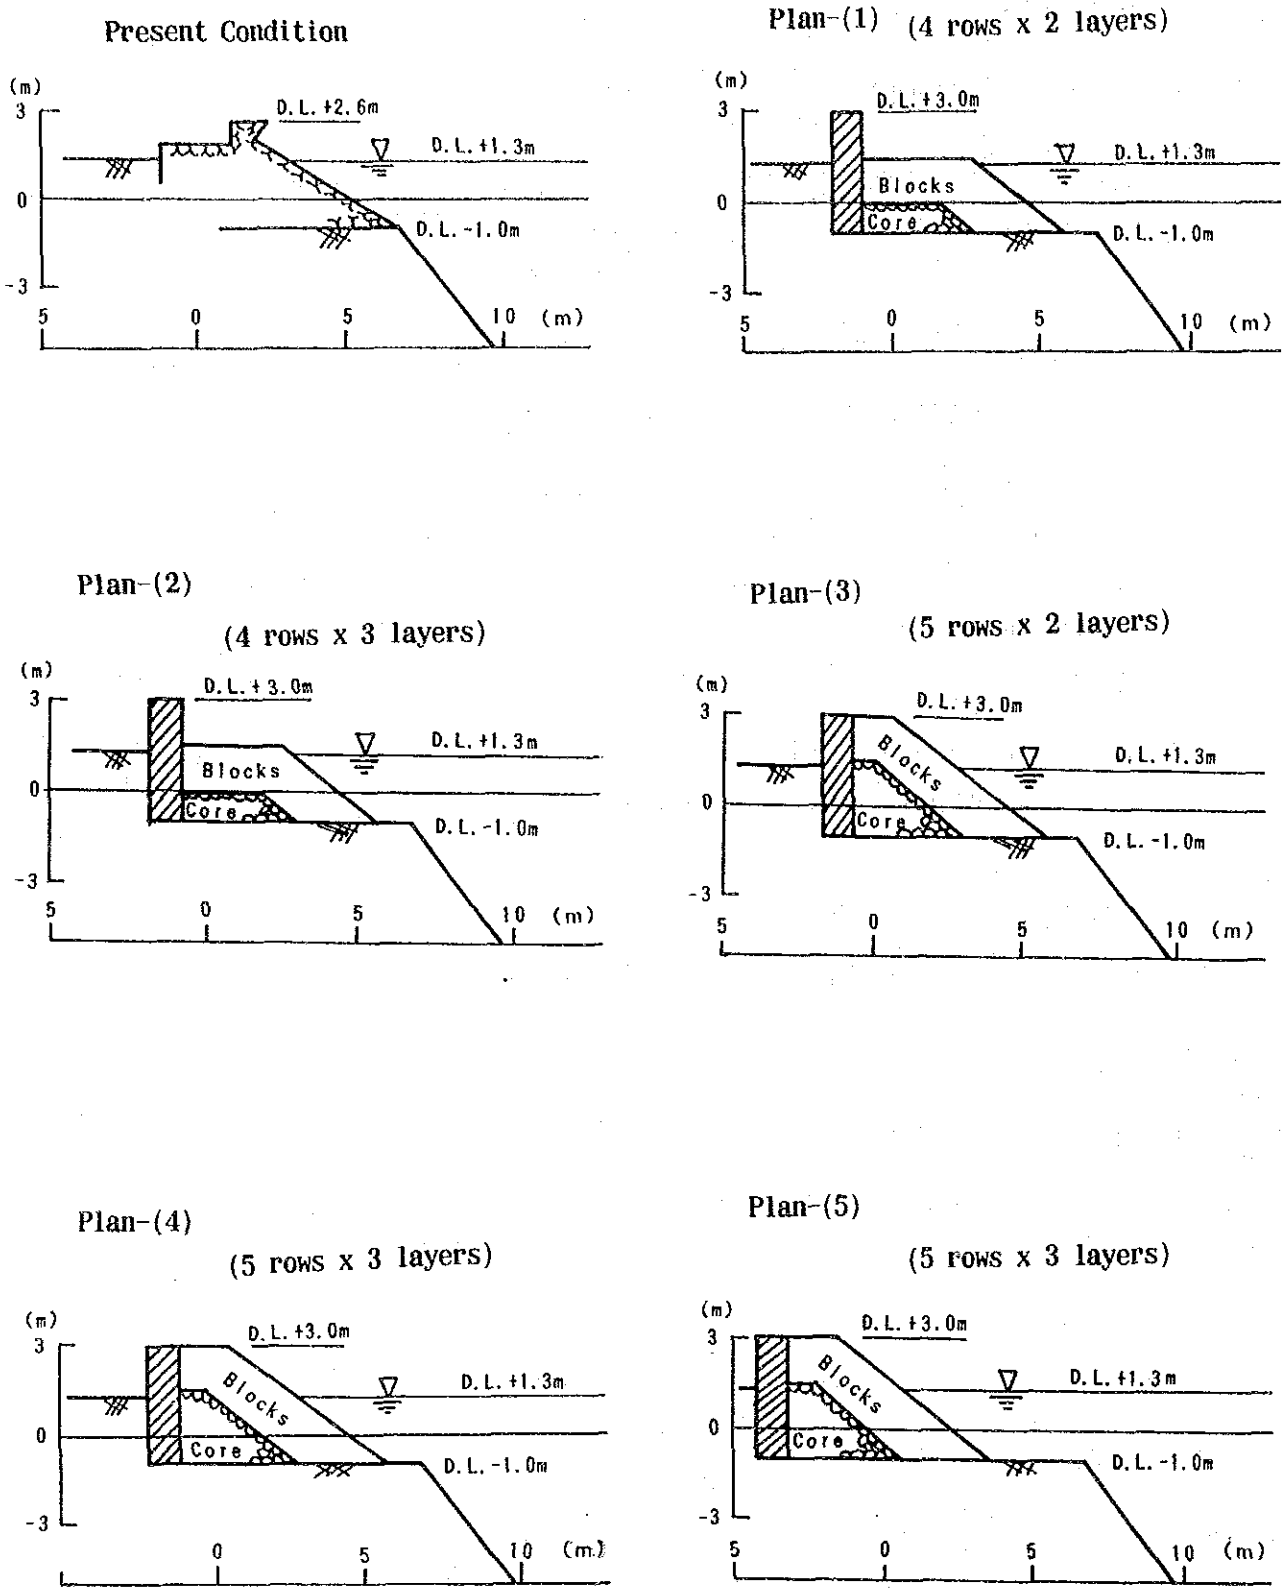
Basic Shore Protection Plans for the West Coast
